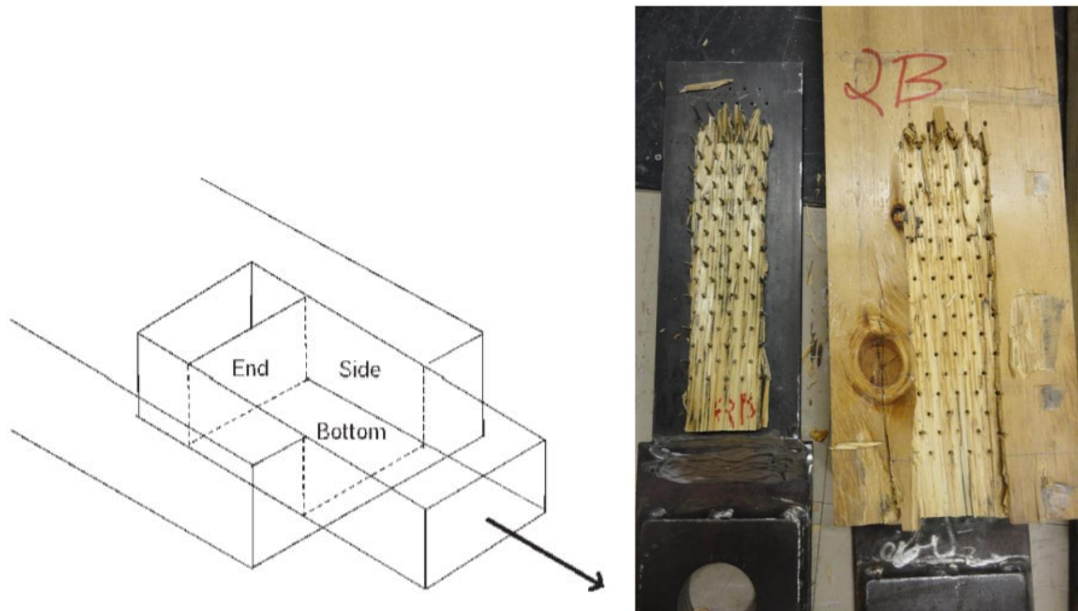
Sketch of a block failure for a timber member (left) [51] and Failure in joint due to brittle/mixed behaviour (right)[37]
